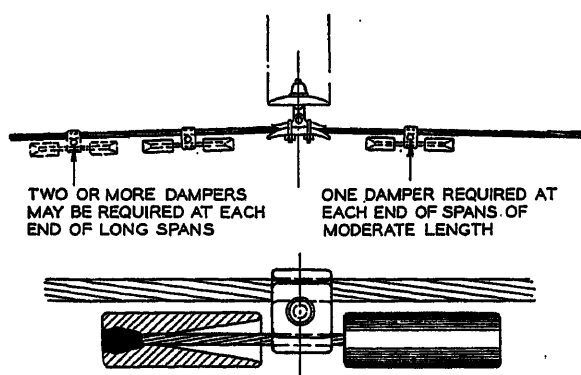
STOCKBRIDGE DAMPER ASSEMBLY
